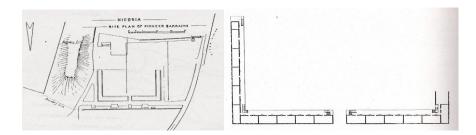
Site plan and partial first floor plan of Pioneer Baracks, Nicosia (Schaar *et all*, 1995)
